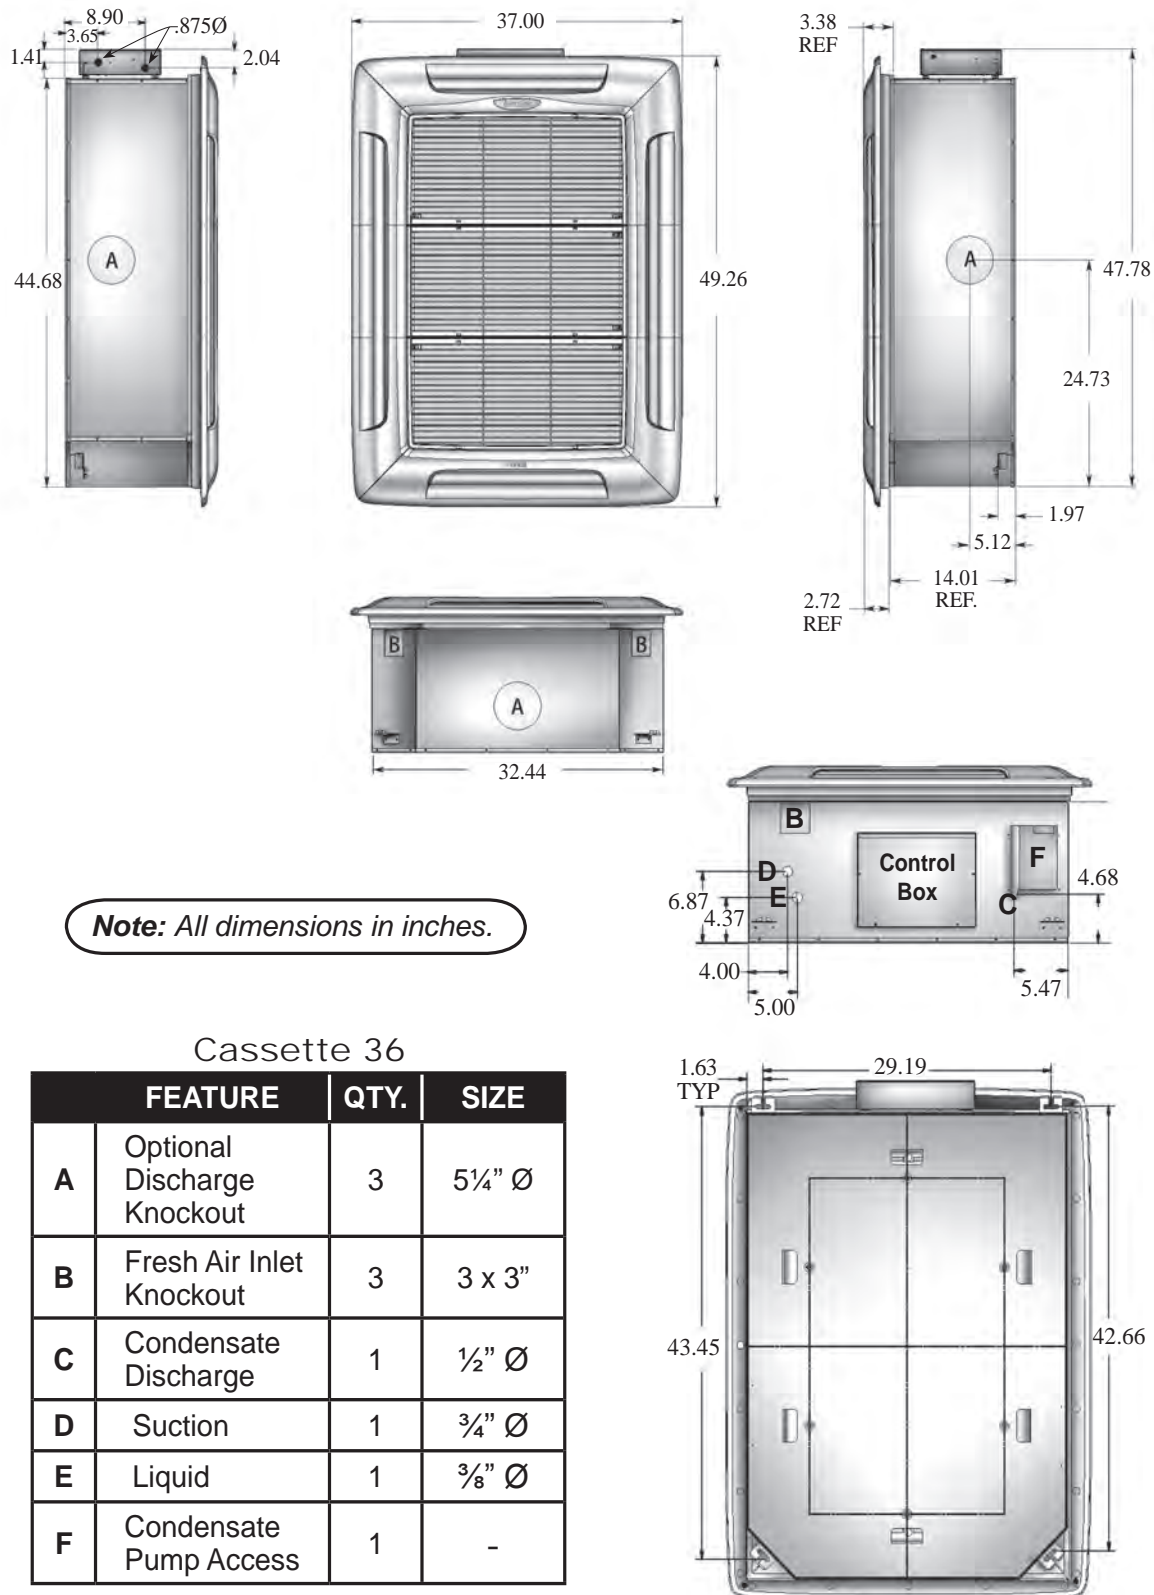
CACG/CAHG/CACH/CAHH ductless air handlers — dimensions, openings and knockouts
